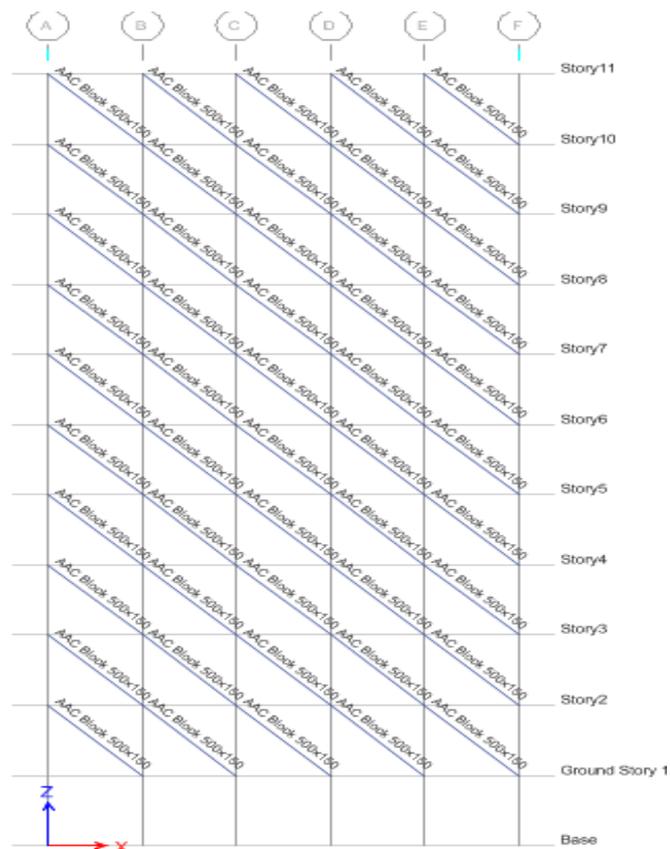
Elevation3D render view of building with AAC blocks as inclinedstruts
